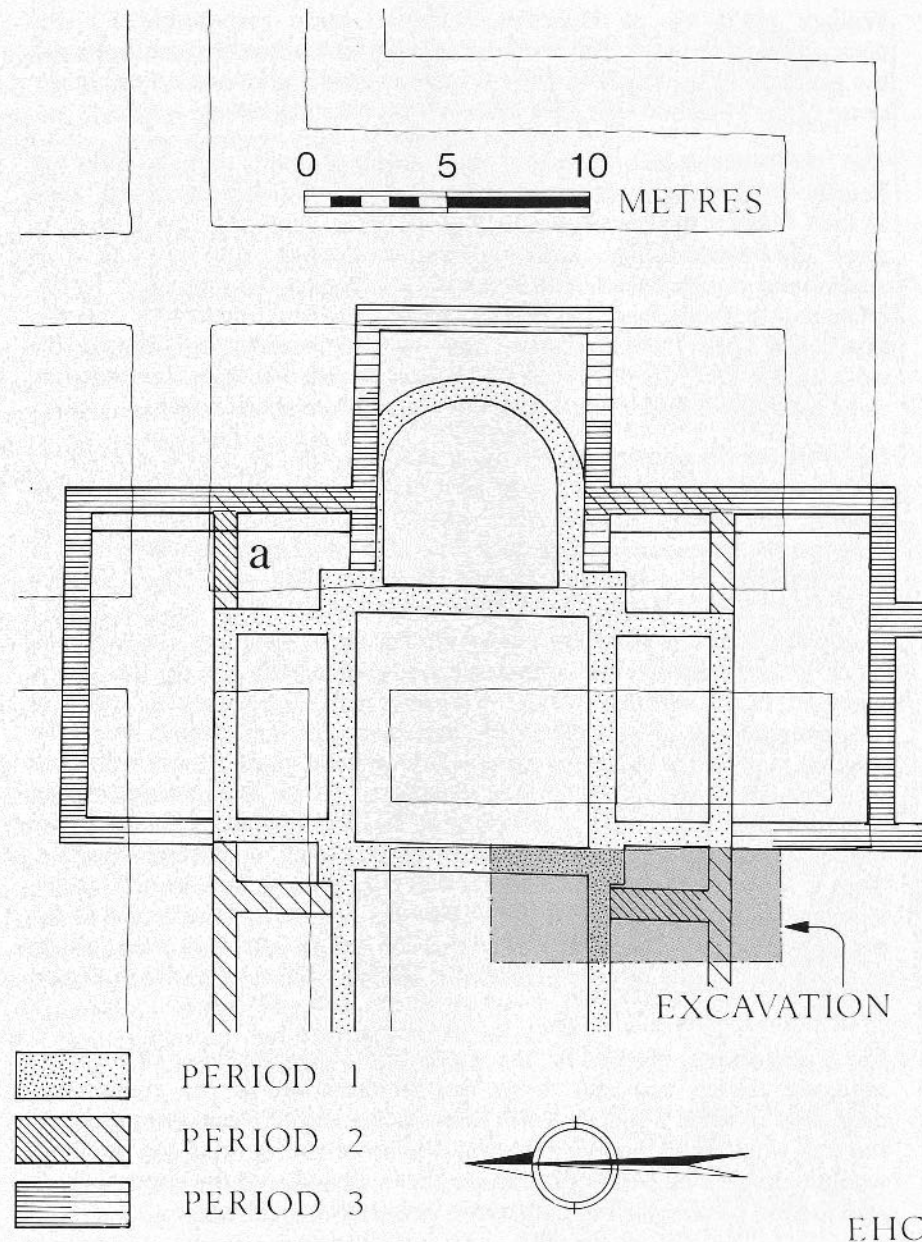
B The east end of the earliest monastic church in Peterborough: the conjectural plan (excavation area shown by grey tone)
